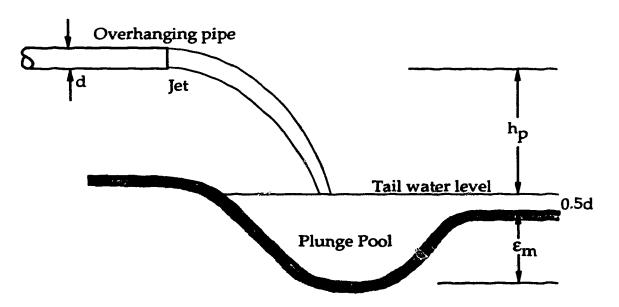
2(b): Definition Sketch for Overhanging Pipe Outlet Erosion
